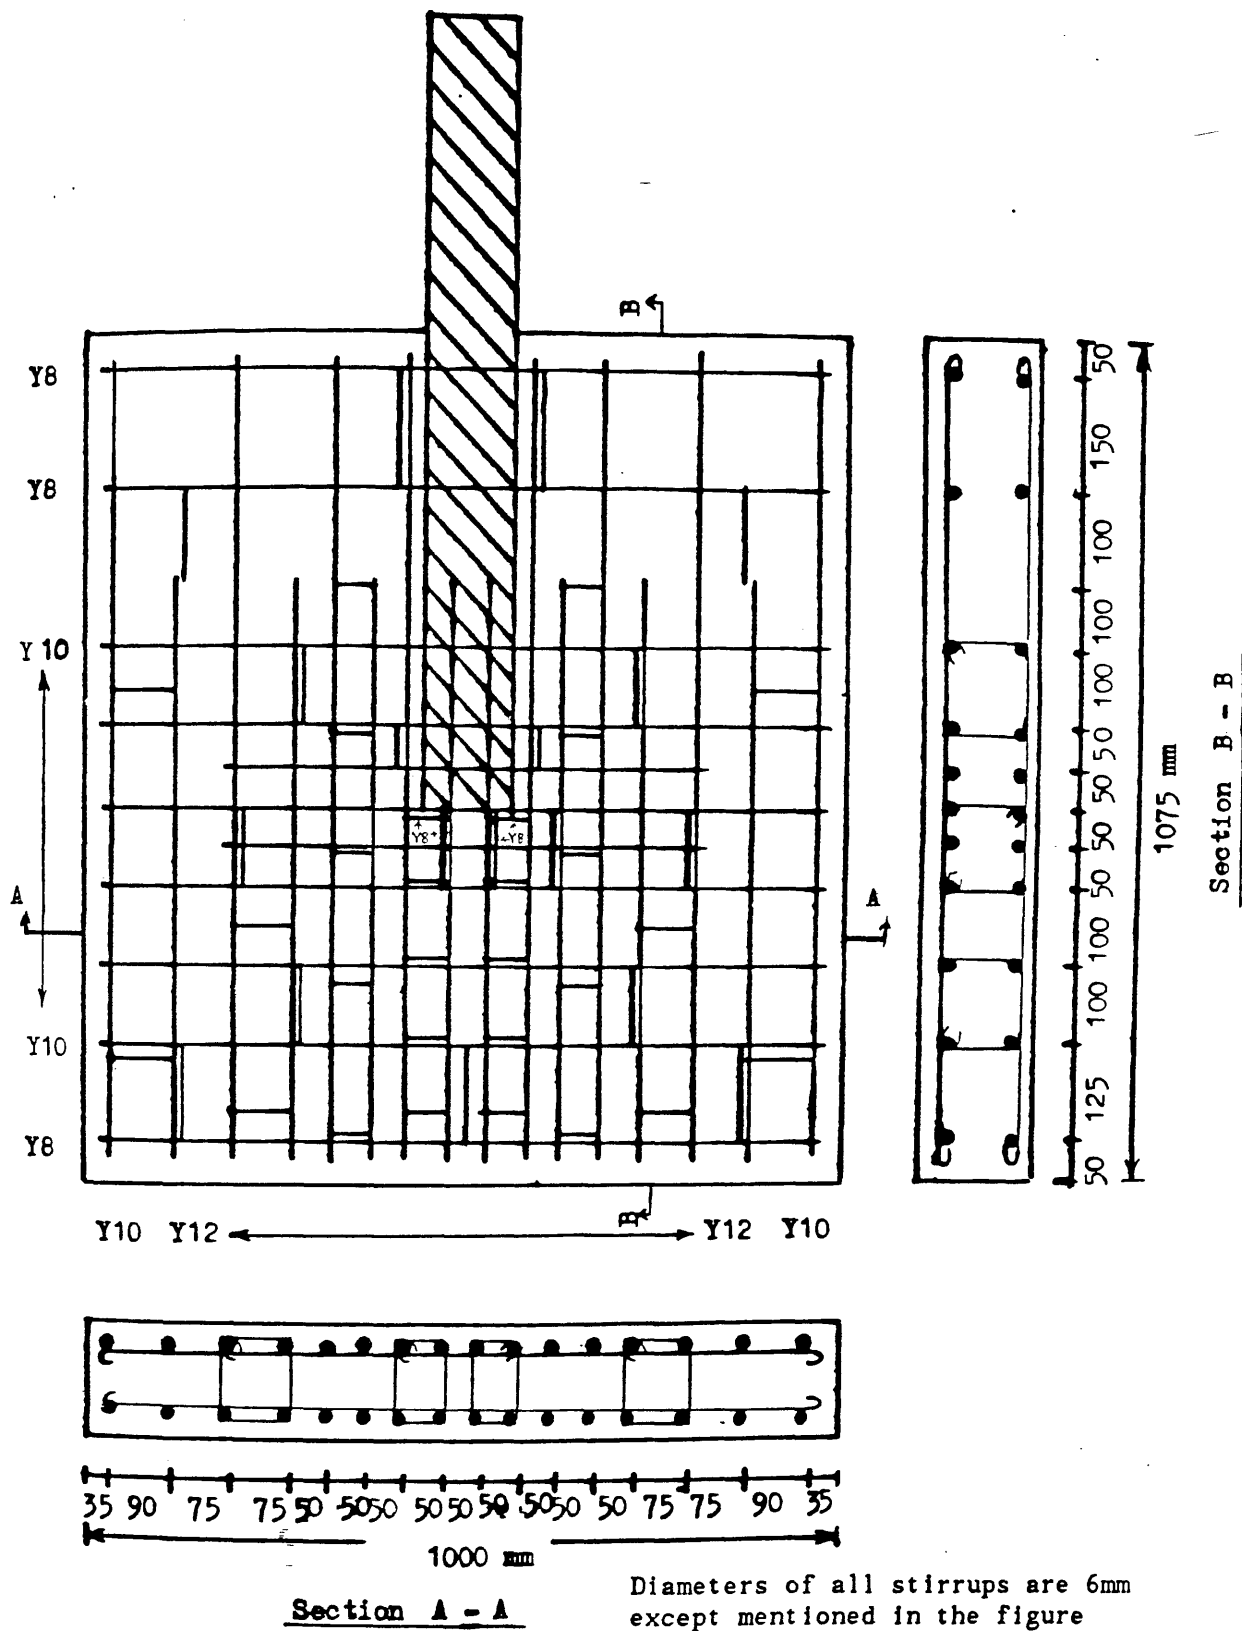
a) : Arrangement of top reinforcing bars including closed vertical stirrup in the slab of model MS8
